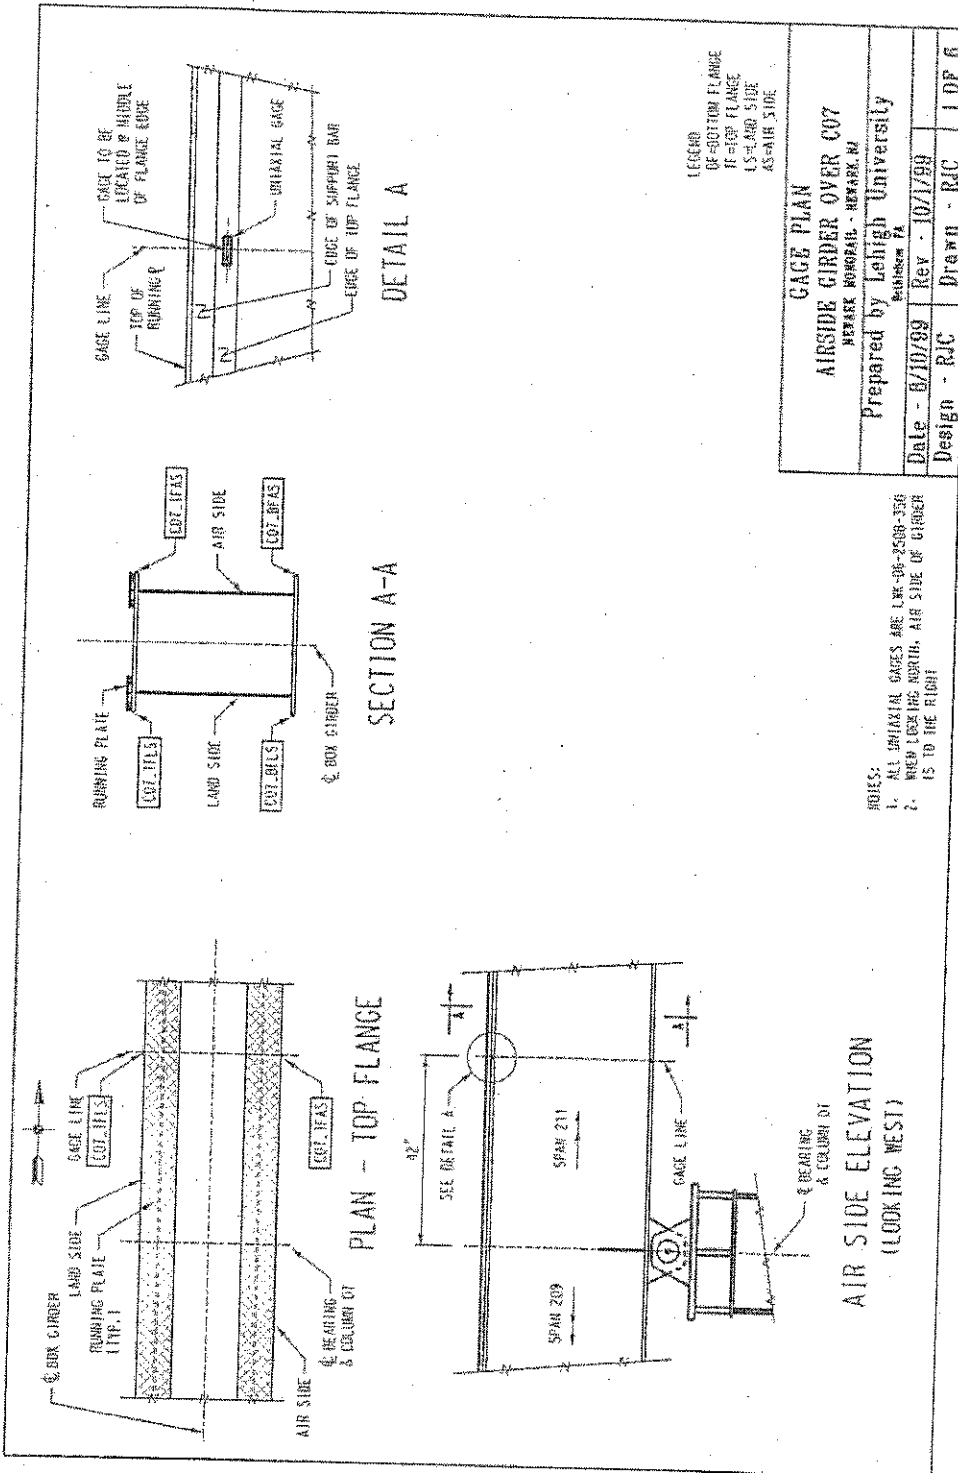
Strain Gage Layout Adjacent to Column 07 - Air Side
